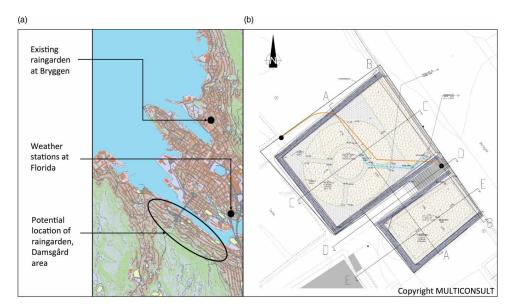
| Overview of the study site, showing the (a) location of existing raingarden at Bryggen, weather stations at Florida and study site Damsgård, and (b) layout of the existing raingarden at Bryggen.
